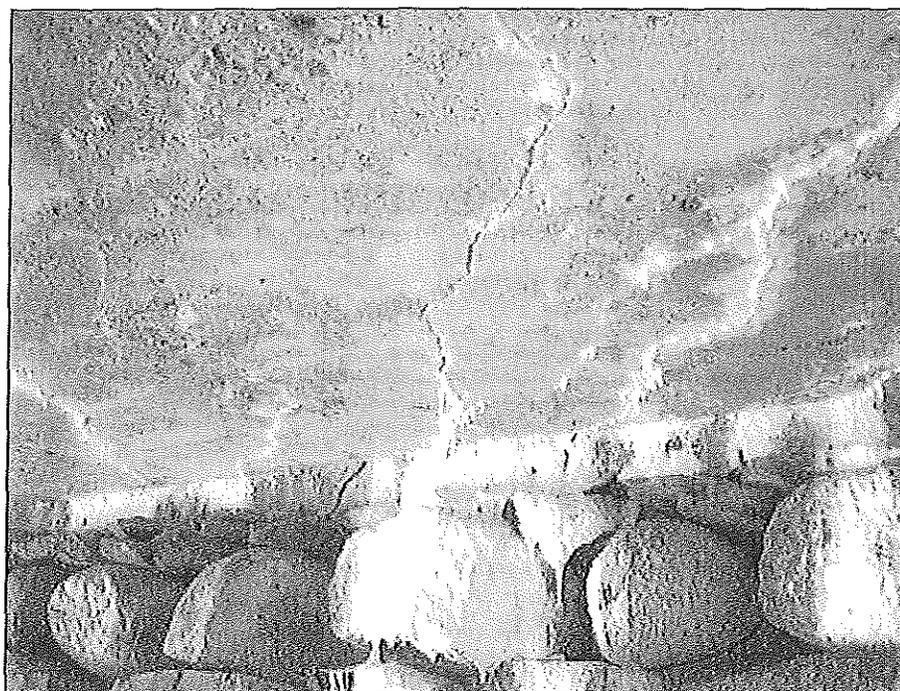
Full length crack in deck 15 ft west of utility pipe
